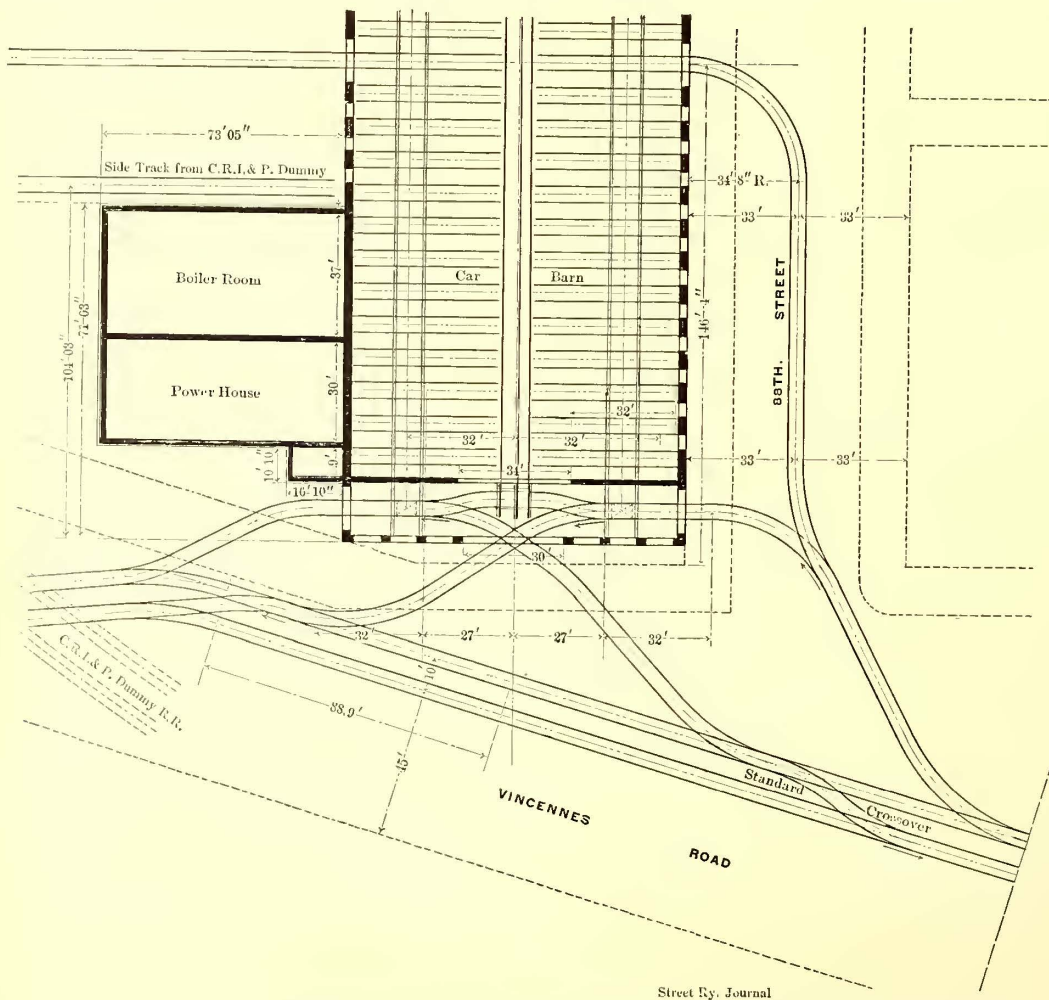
PLAN OF CAR HOUSE AND POWER STATION, SHOWING ARRANGEMENT OF TRACKS.
